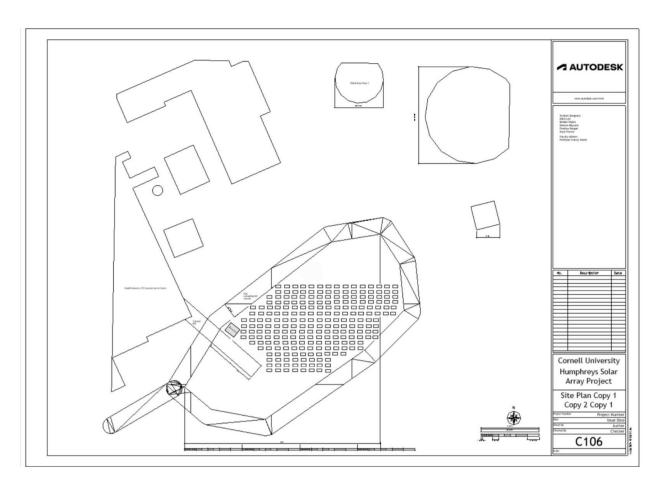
Revit of Proposed Solar Array Layout: Single-Mounted– panels spaced away from Conveyer belt
